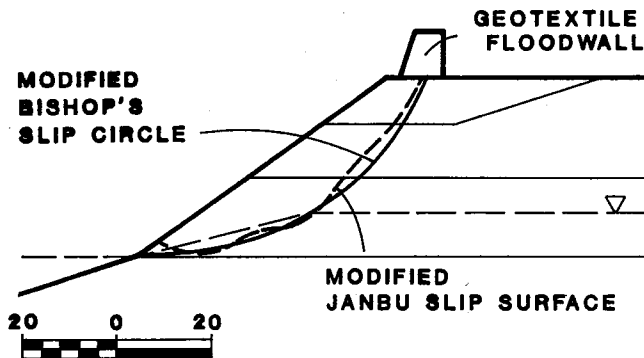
Profile of embankment illustrating slope stability analysis without geotextile retaining wall.
